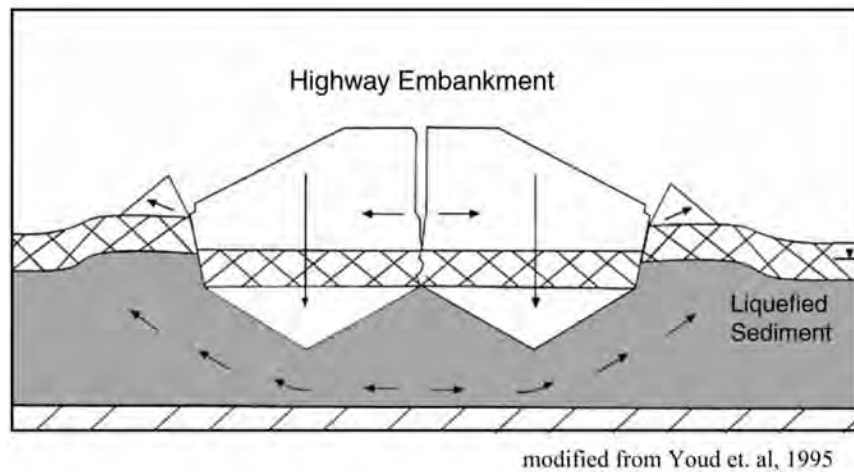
Failure Mechanism for an Embankment Founded Upon Liquefied Soil
